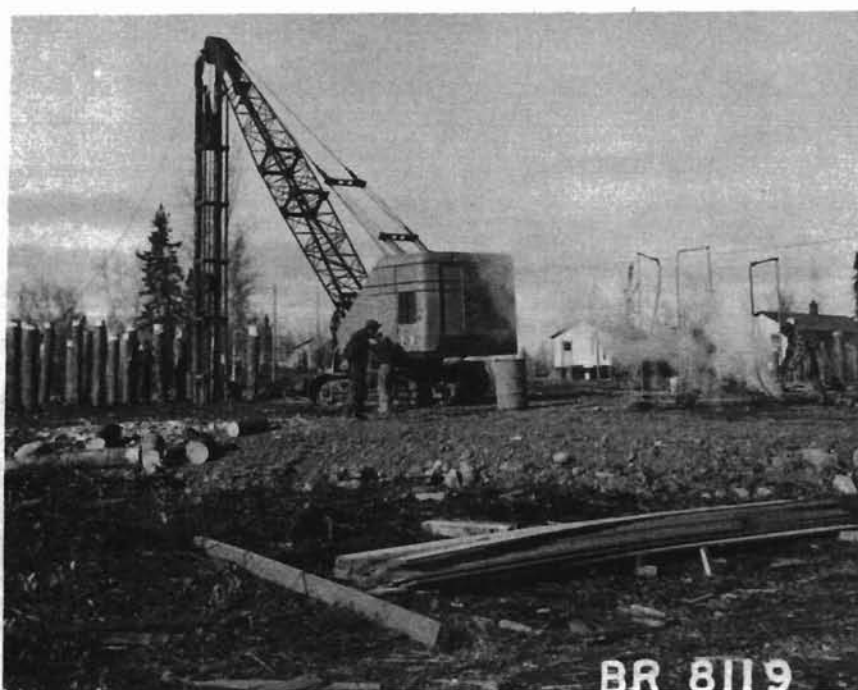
Pile steaming and driving on gravel pad for building foundation in continuous permafrost zone.
